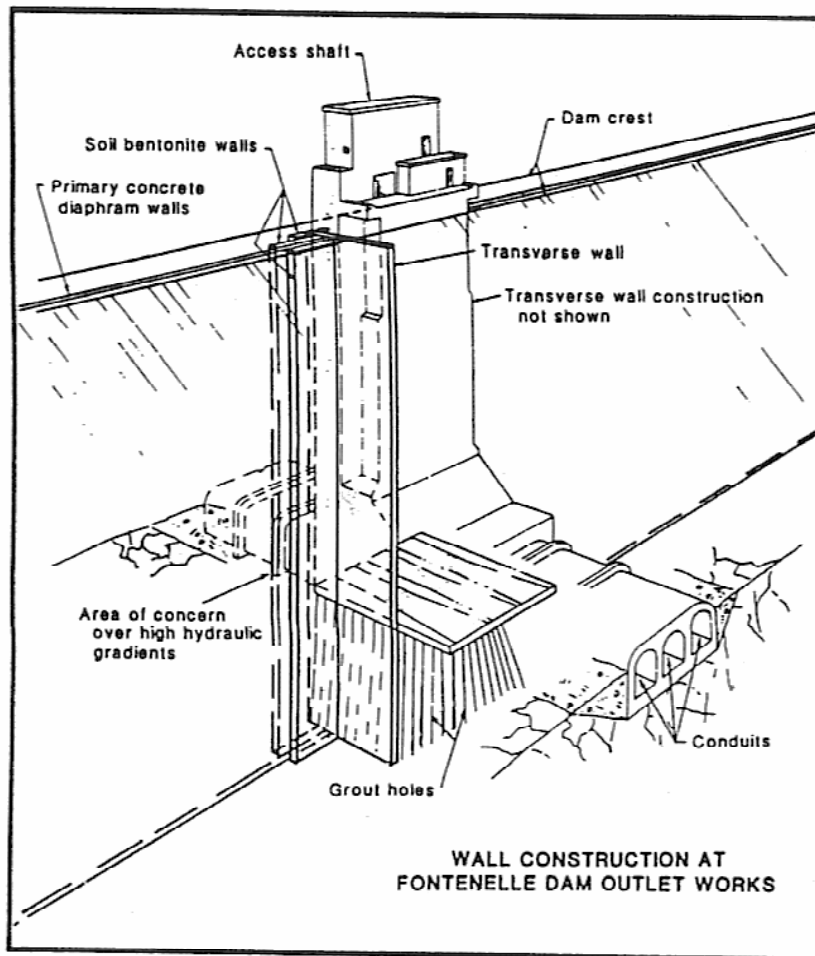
Cut-off wall, and back-up soil-bentonite panels, Fontenelle Dam (76).
